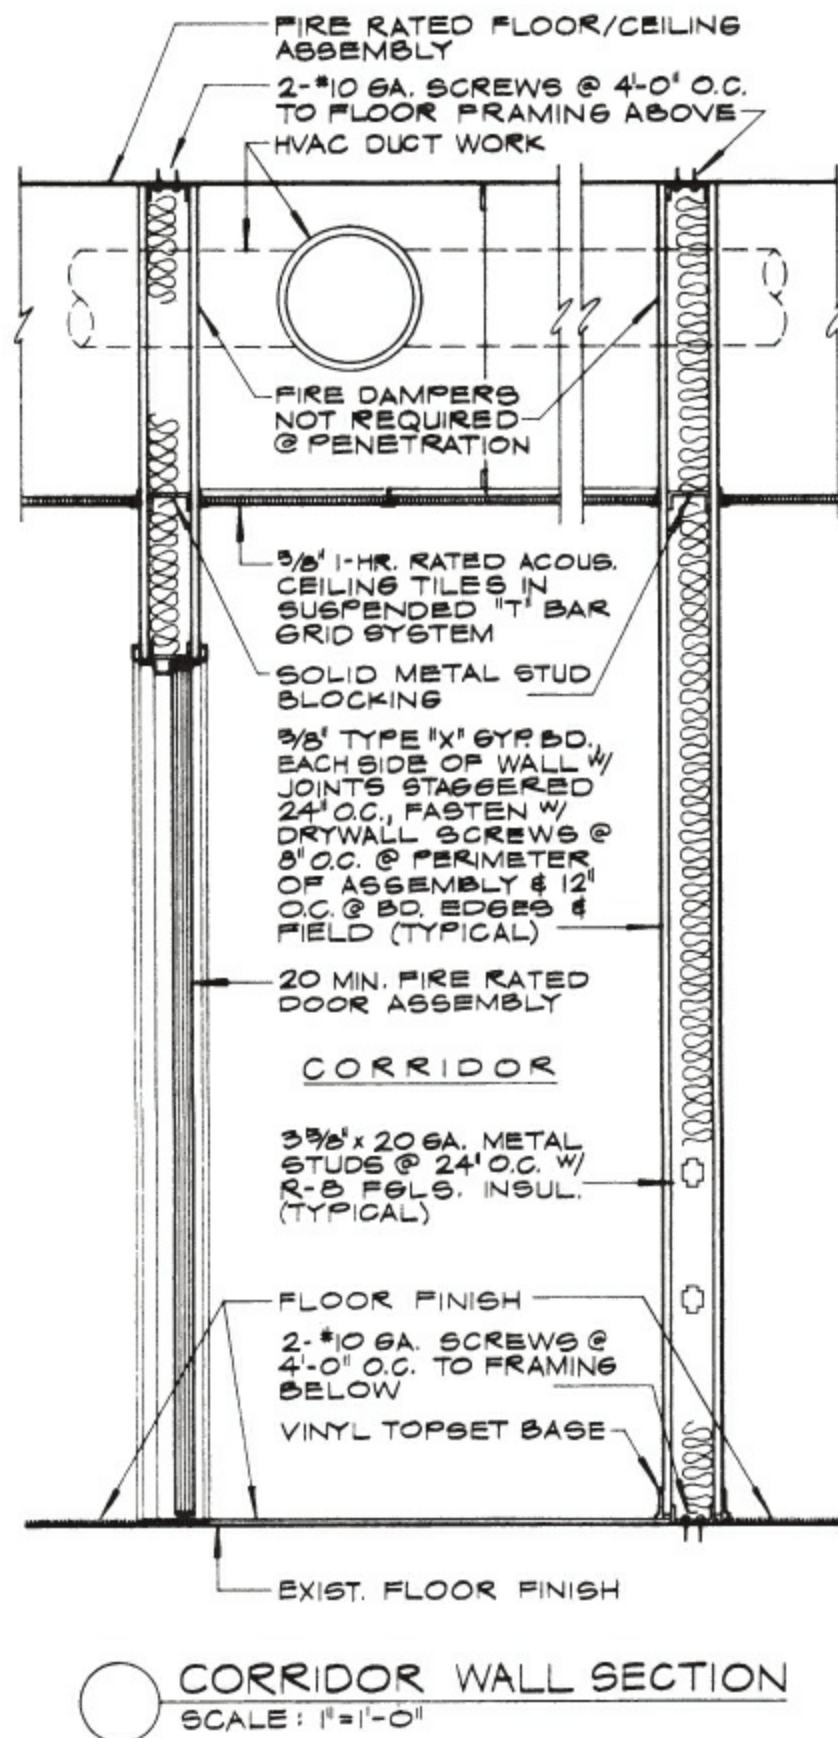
(#) shows a pictorial with a corridor that satisfies code relative to width and location. The walls and ceiling construction of the corridor must meet the requirements for a one...hour fire...rated assembly. A detailed construction section of this assembly is depicted in [Figure 14.9](#). Metal studs are illustrated; however, wood studs may be used if they meet the governing fire code requirements. It should be noted that most building codes require exit doors into the corridor to have a 20...minute fire...rated assembly, as
